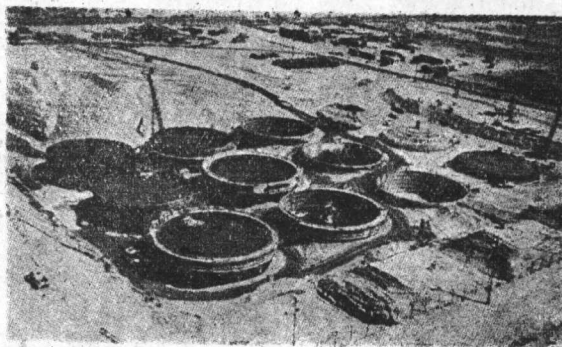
Construction of a waste-storage tank farm showing operations of pouring concrete walls with the inner steel tank filled with water. Backfilling of earth, sandblasting for interior-surface preparation and dome and wall forming
